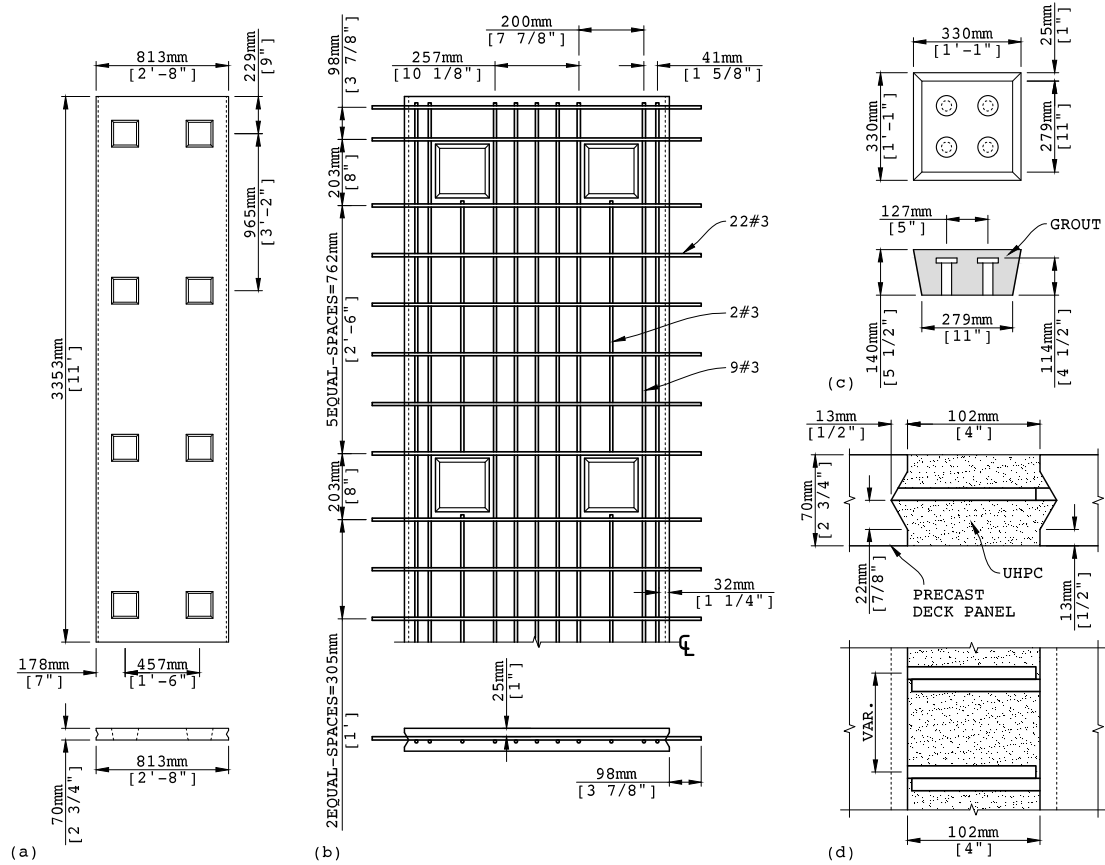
Details of a typical deck panel: (a) general dimensions, (b) details of reinforcement, (c) deck pocket details, (d) details of deck panel joints
